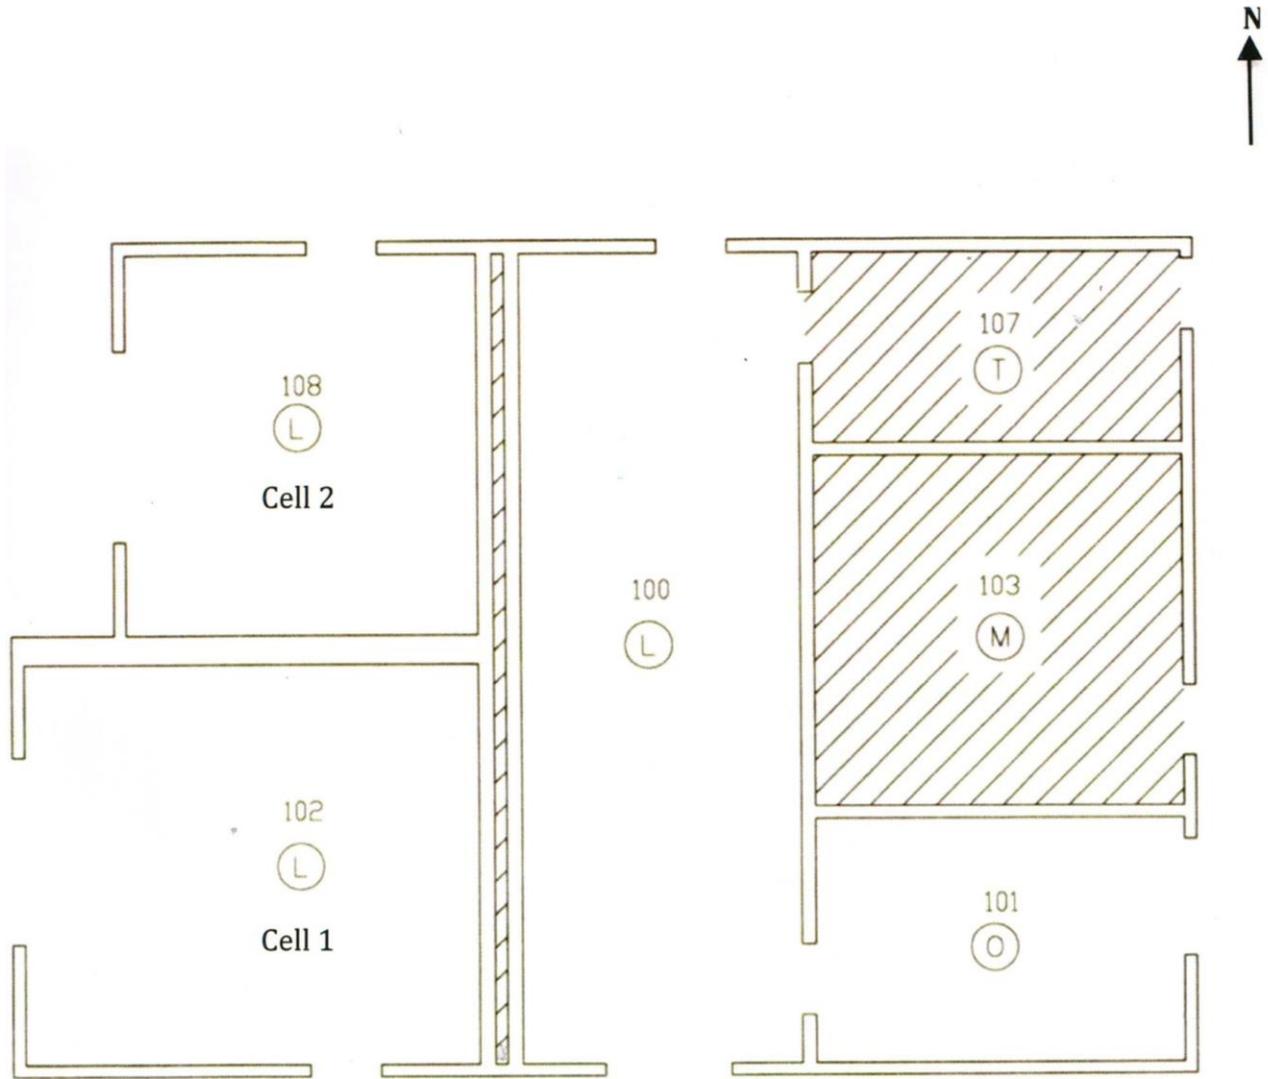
Lab Building 826, Facility Keyplan, 1996. LLNL Archives, (PKS96-826-001B)
